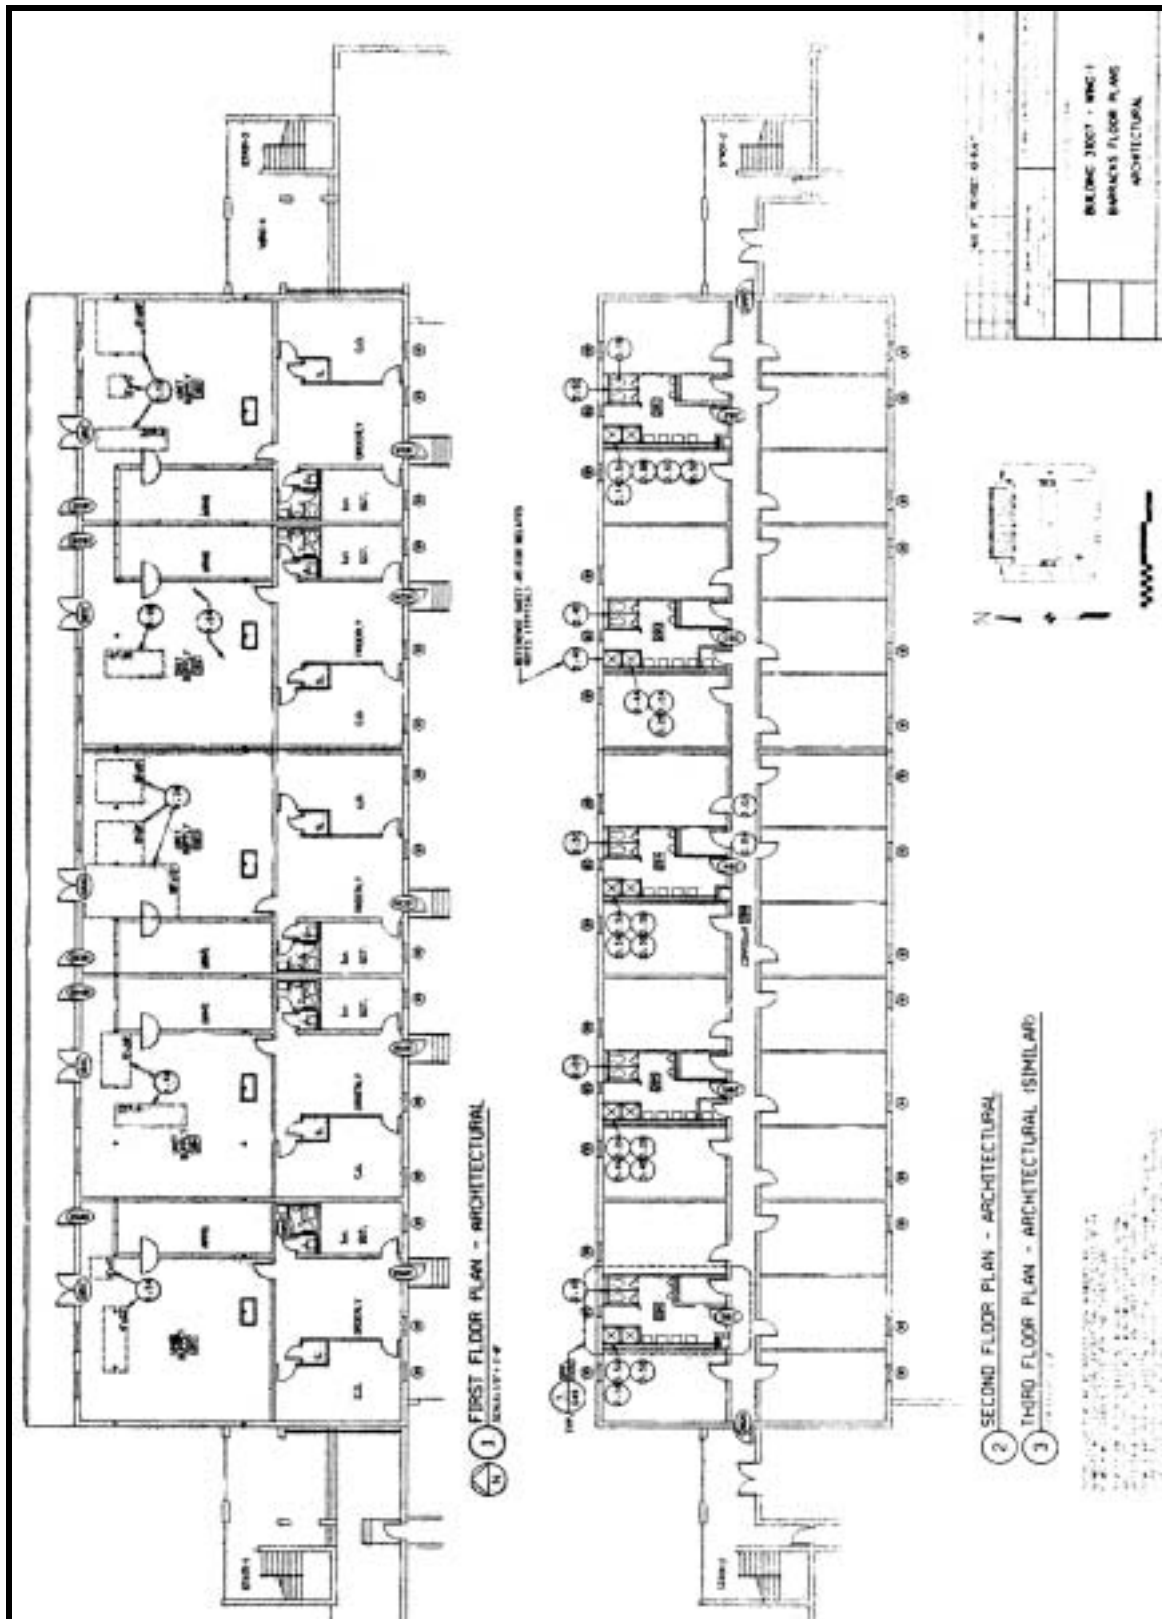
A-style barracks, Bldg. 31007 floor plans, wing 1 (ca. 1971, revised 1997) (Engineering, Ft. Hood).
